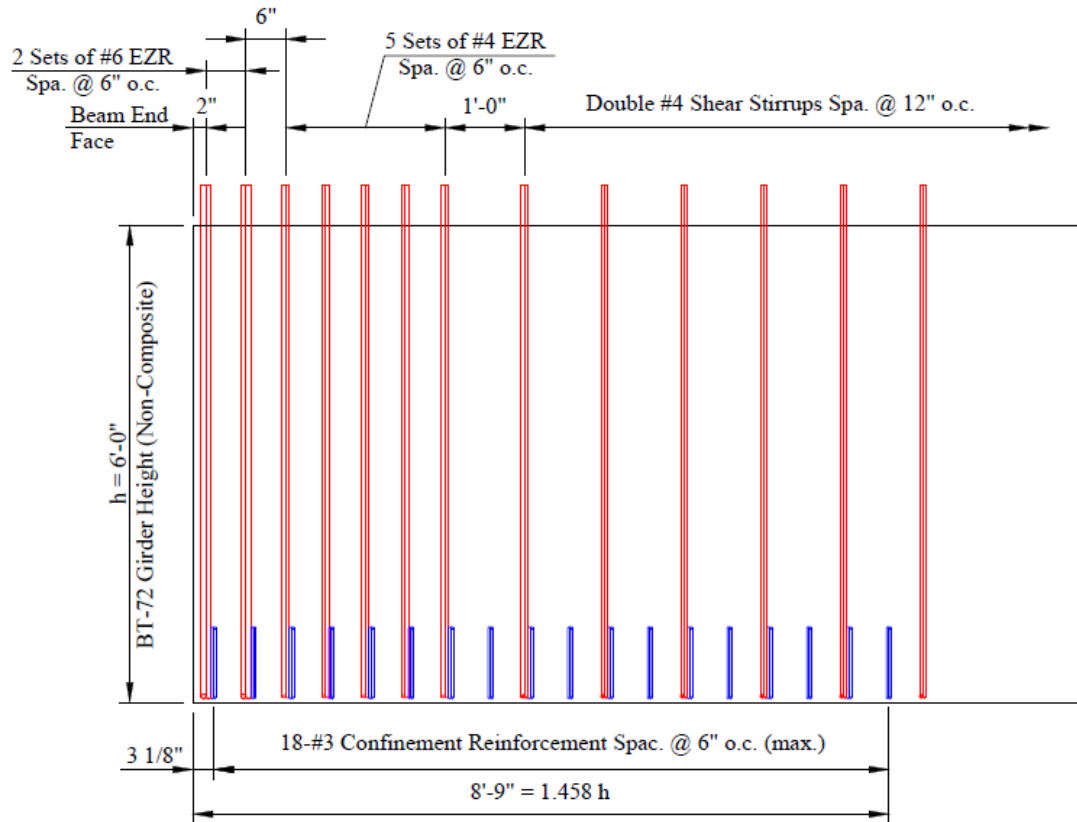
Typical elevation view of the BT-72 girders showing the spacing of the end zone reinforcement (EZR) as well as shear and confinement reinforcement in accordance with NCHRP Report 654 referred to as Nebraska Detail in this document.
